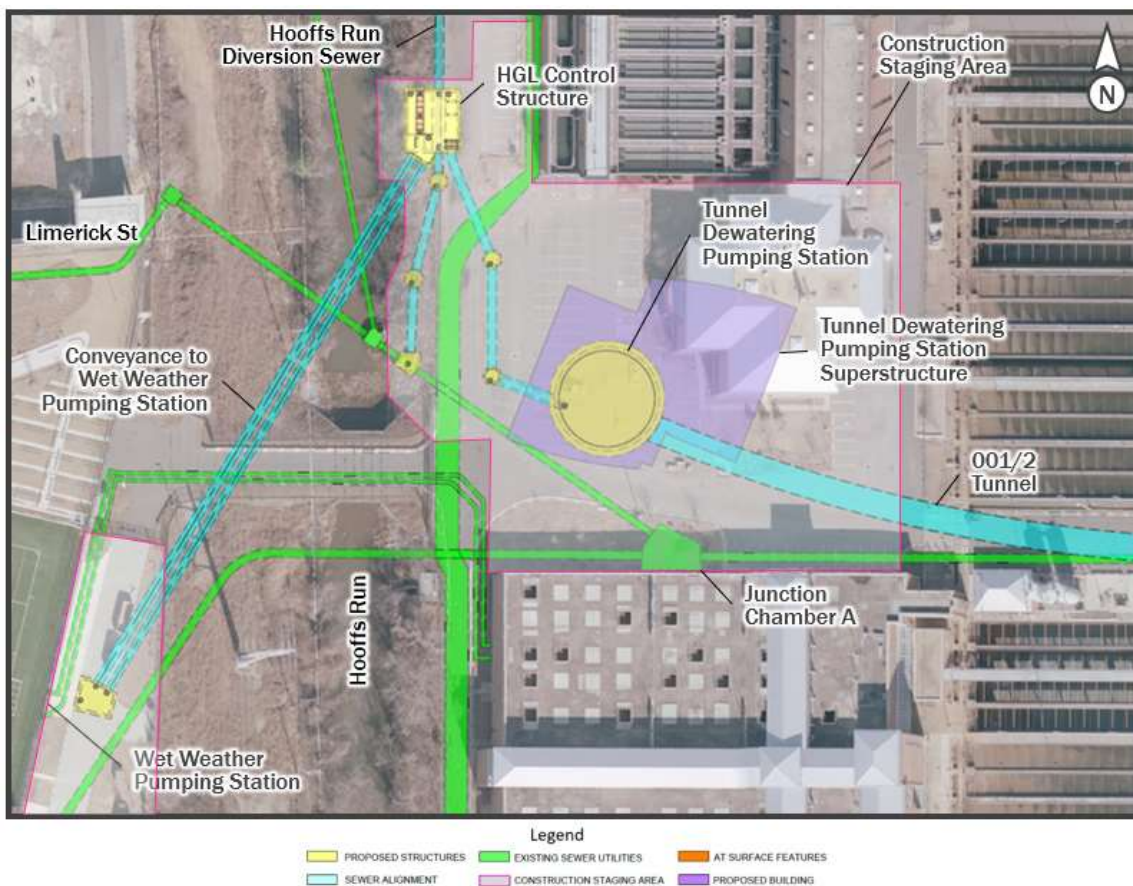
Hooffs Run Diversion Sewer Structures at the WRRF
